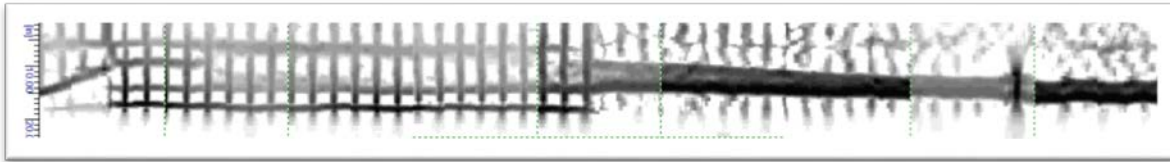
Blockscan of south interior beam from east abutment to center line (Bridge 8761).
